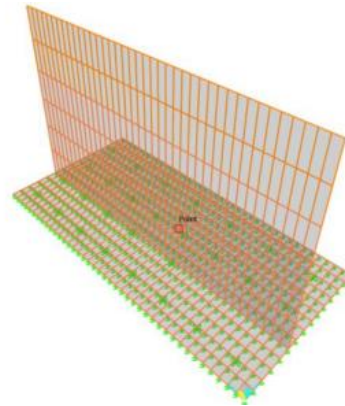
Modeling of 10 Meter Retaining Wall Structure (Section 1 & 2)
